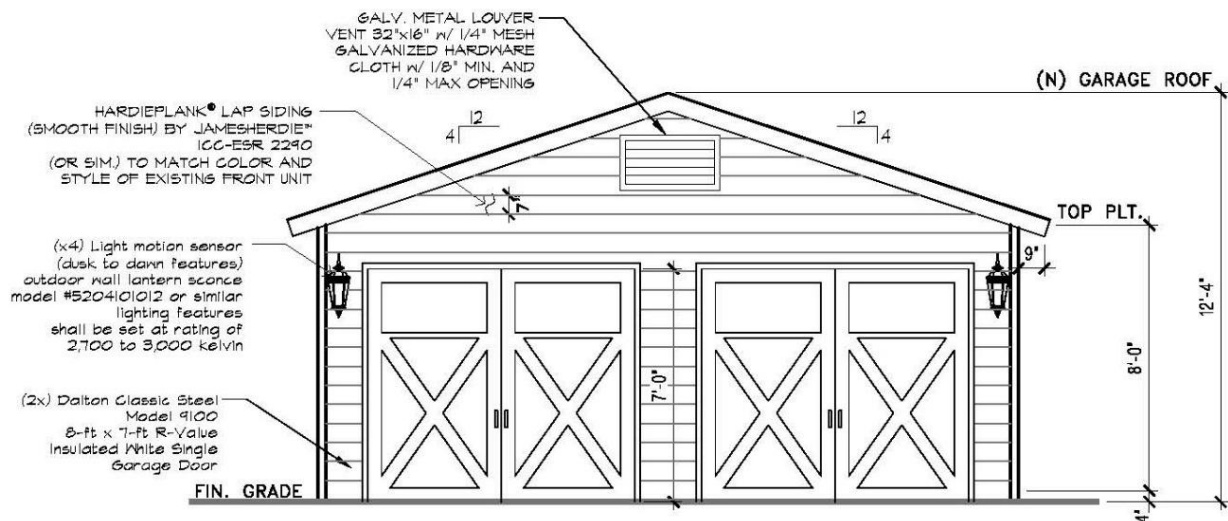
Proposed garage, primary elevation (not to scale; Allstar Design and Engineering Group)
